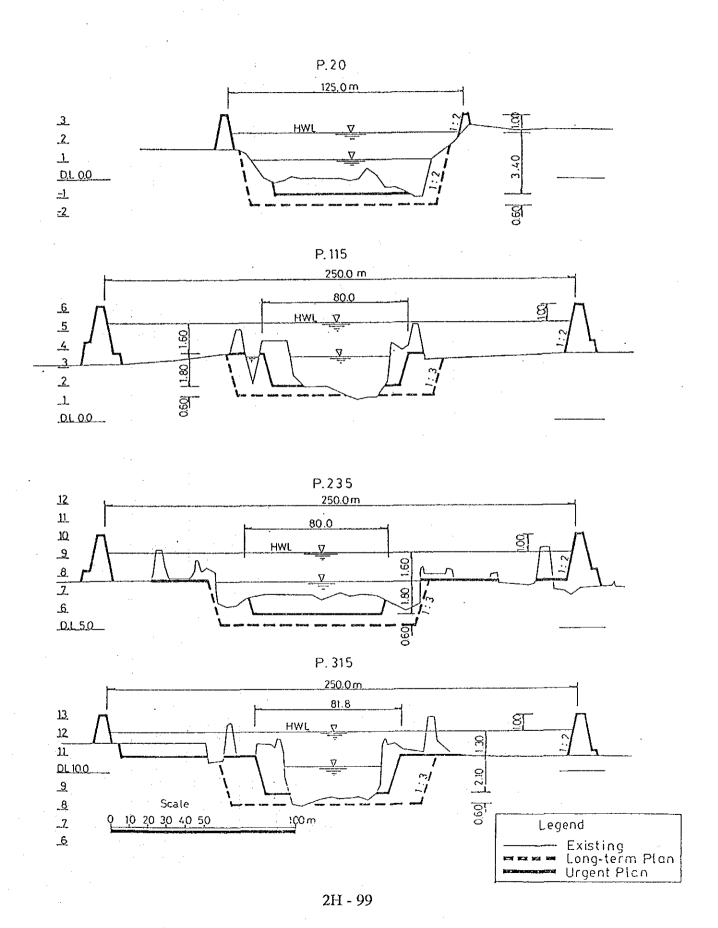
Proposed Urgent Plan of Asahan and Silau Rivers (6/6)
